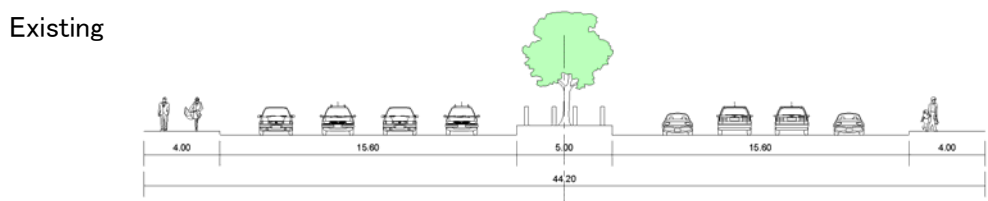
Existing and Planned Cross Sections on Av. Almirante Barroso (1)
